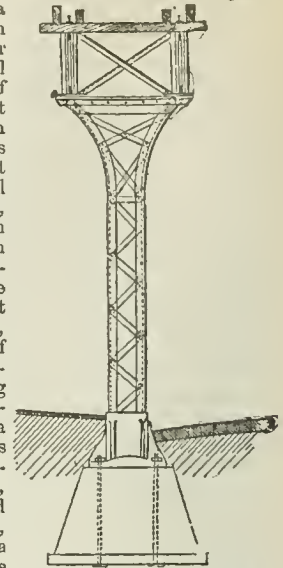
New York Elevated Railroad. Square lattice-work column.
